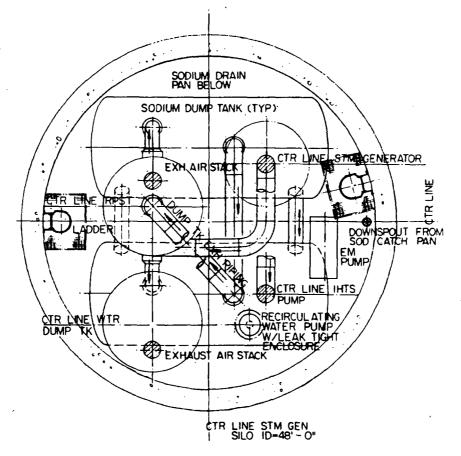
STEAM GENERATOR FACILITY PLAN VIEW
